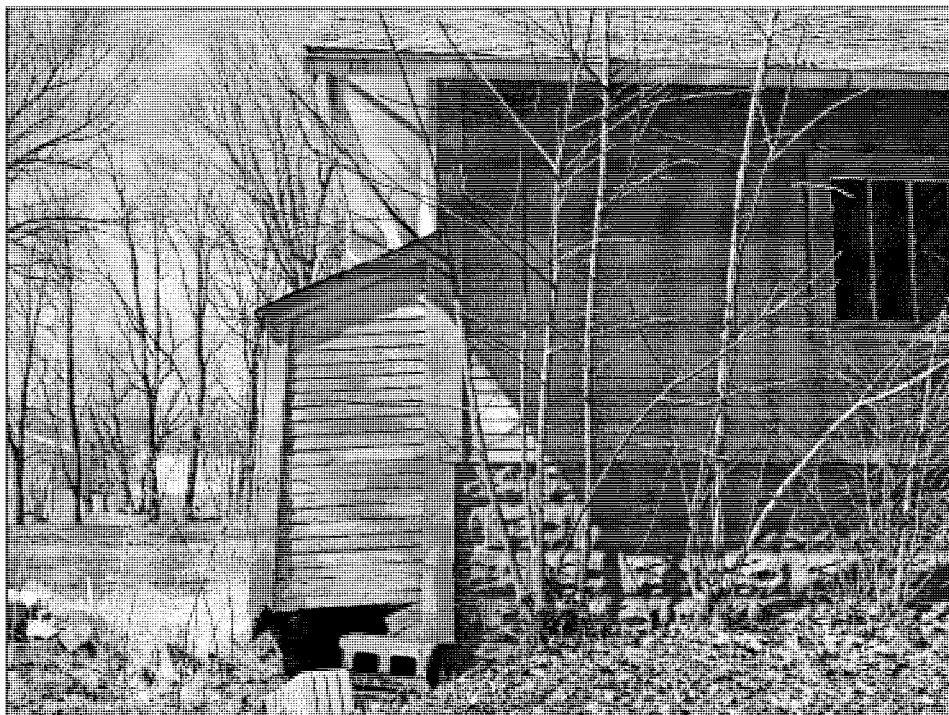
, profile view of garage bump-out, view north (photo by Linda McCann, 2006)
